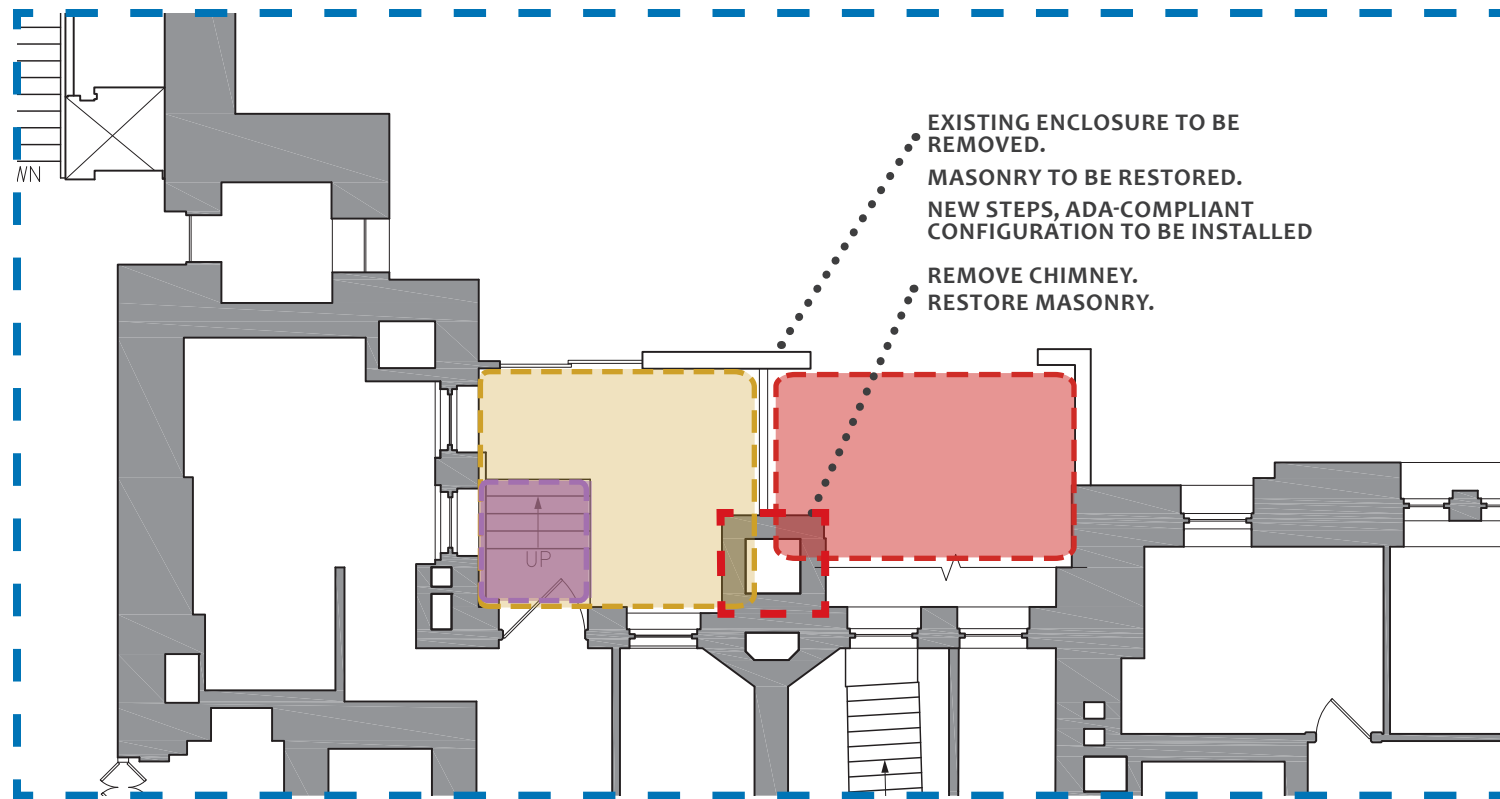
Enlarged "As-Found" Basement Level Floor Plan and the Northeast Exterior Storefront Entrance.
